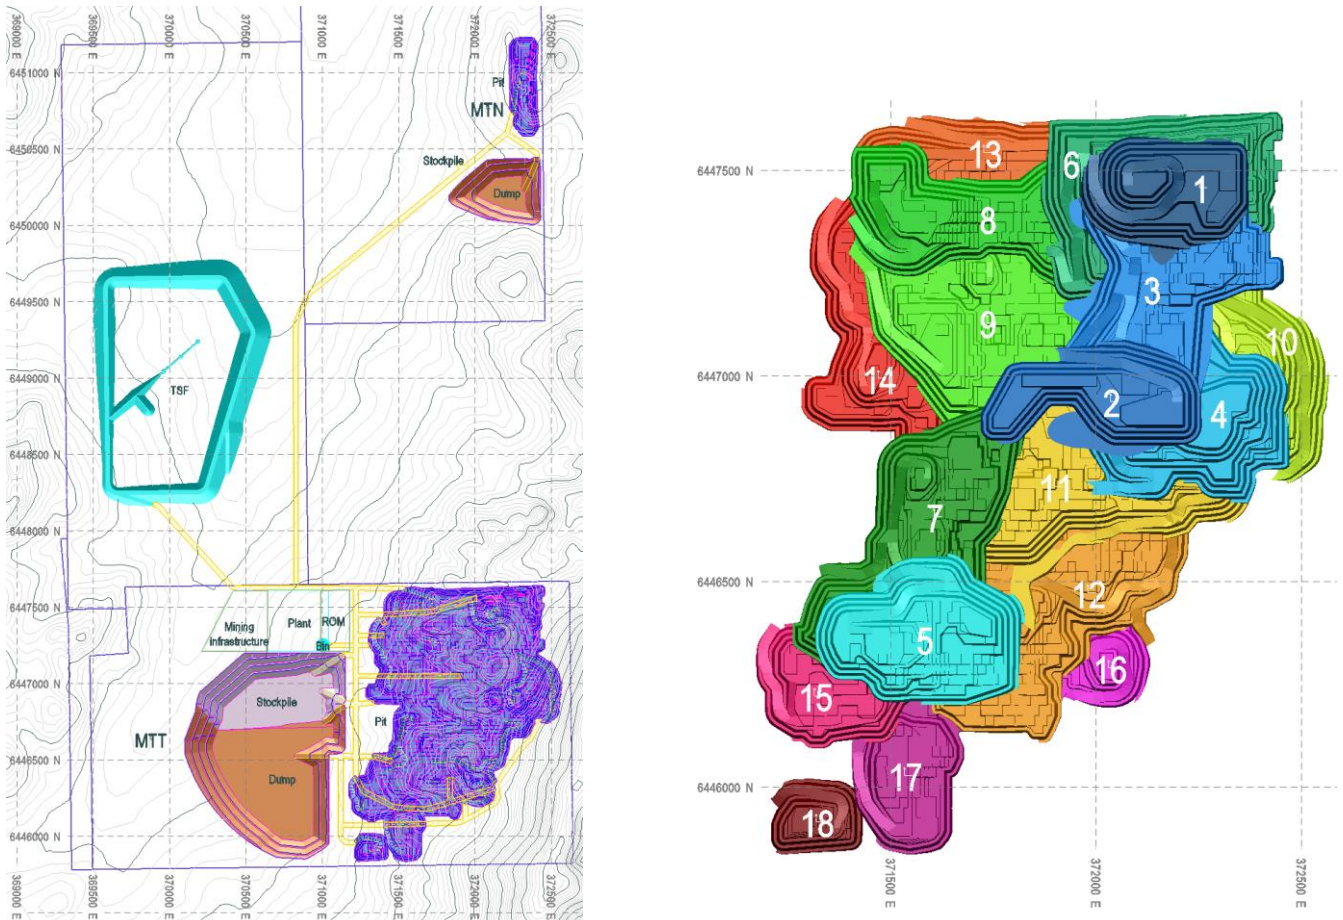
Preliminary mine layout showing pits, dumps, plant, infrastructure and TSF (left) and pit stages (right).
